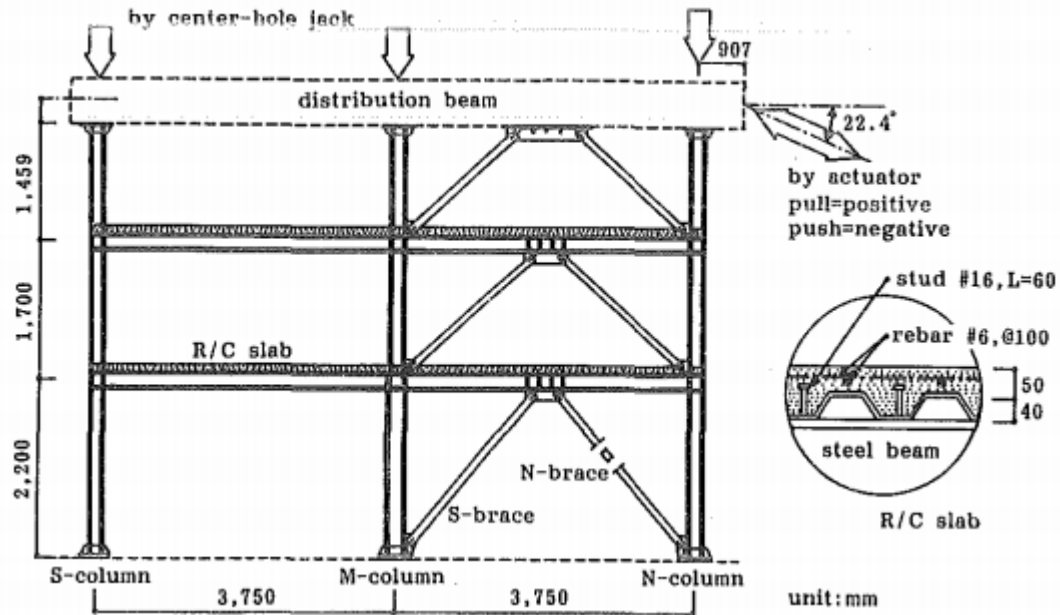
U.S./Japan 3-story test frame elevation (Fukuta et al. 1989).
